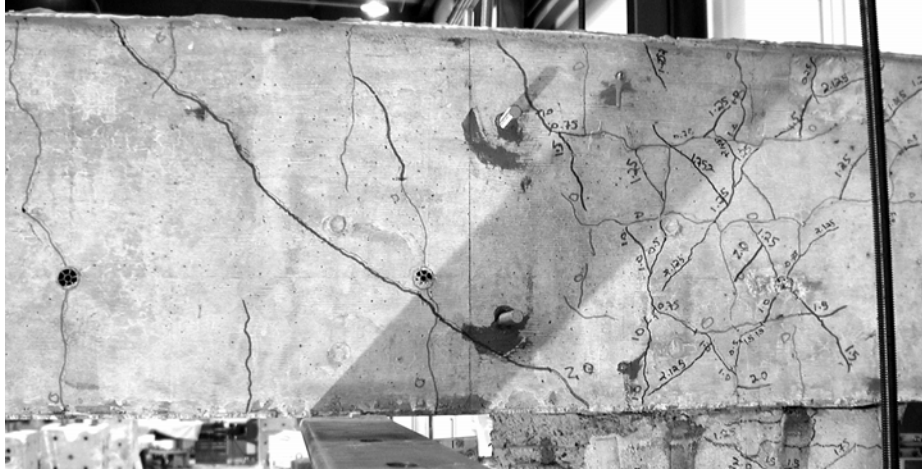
LFCD2 Crack Pattern after Bucket Removal
